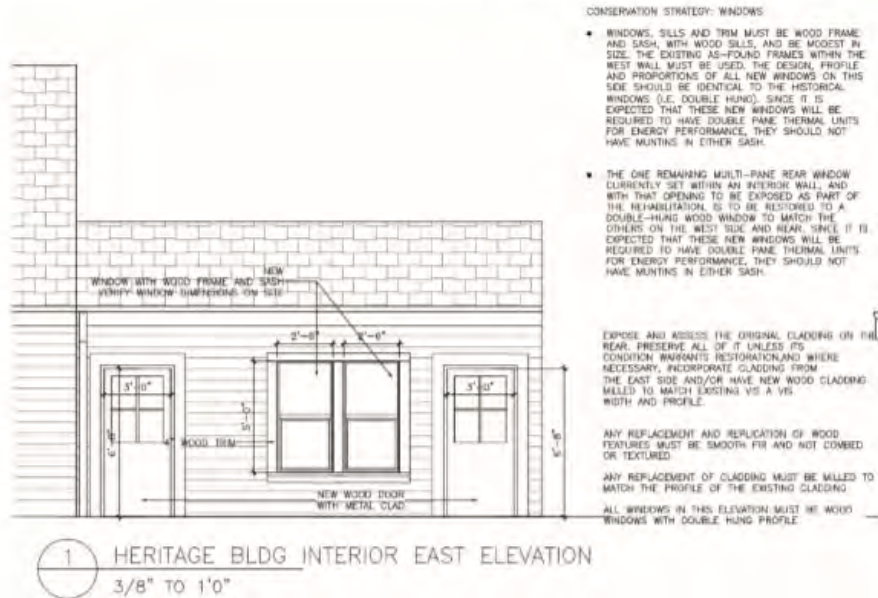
Proposed Interior Elevation, Ikeda Dry Goods
